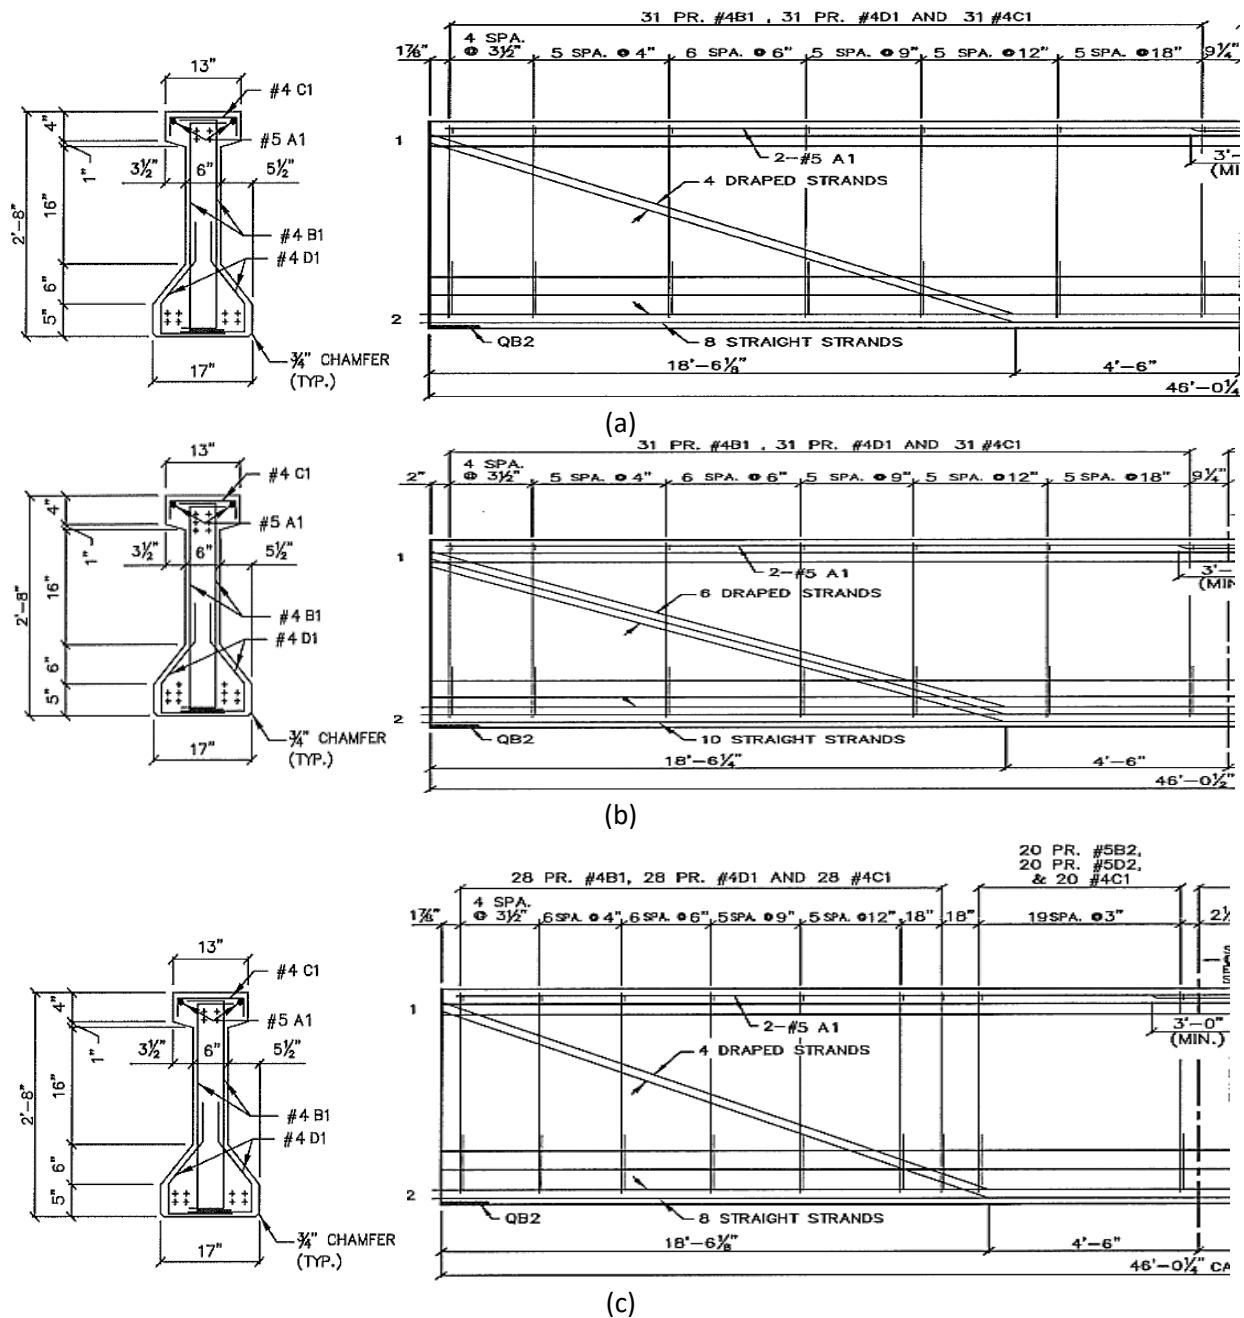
Test specimens reinforcement details (a) 12 strands, (b) 16 strands, and (c) 12 strands – additional stirrups
